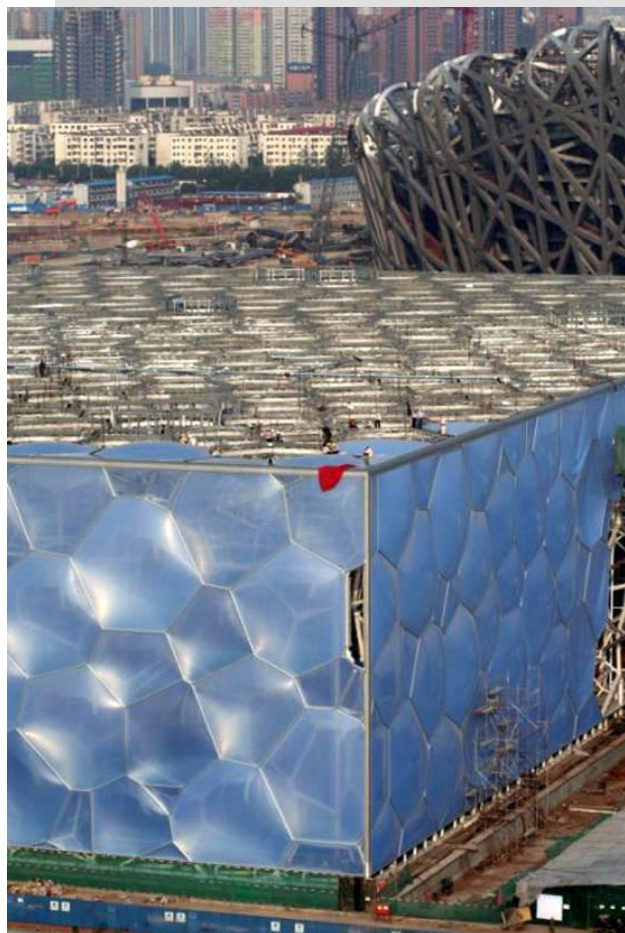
and 46 – Images of Water Cube Pavilion while under construction.
